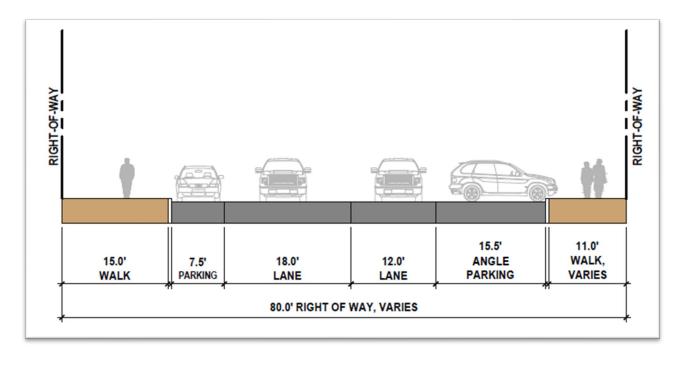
4th St - Existing Cross-Sections Between Ute Ave & Colorado Ave
